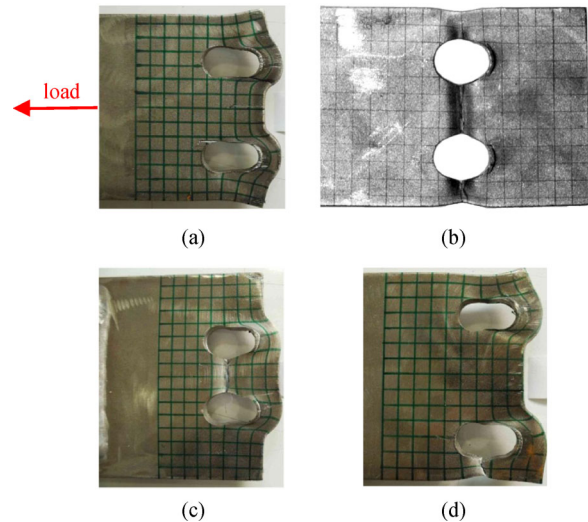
Failure modes of two-bolt connection by Može and Beg [17,19]. (a) Plate shear failure; (b) net cross-section failure; (c) mixed failure I; (d) mixed failure II. (Reprinted from Journal of Constructional Steel Research, 66(8–9), Može P, Beg D, High strength steel tension splices with one or two bolts, 1000–1010, Copyright 2010, with permission from Elsevier. Reprinted from Journal of Constructional Steel Research, 95, Može P, Beg D, A complete study of bearing stress in single bolt connections, 126–140, Copyright 2014, with permission from Elsevier.)
